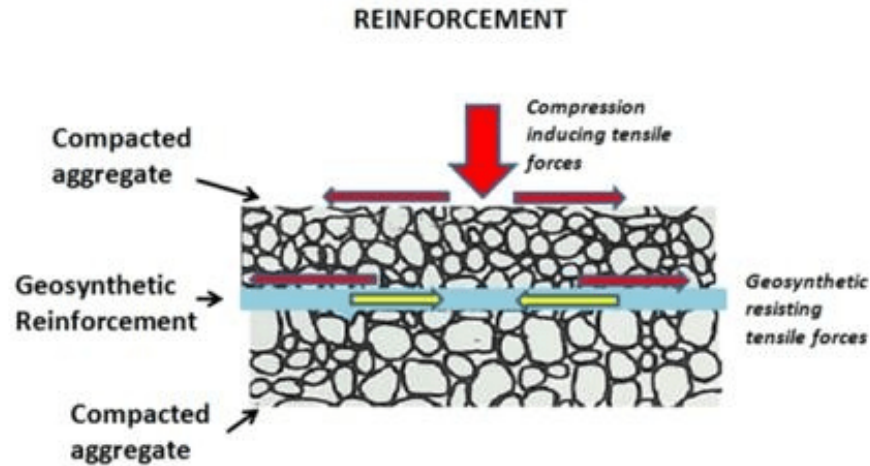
Reinforcement Function of Geotextiles (Hao, W. *et al.* 2020)
